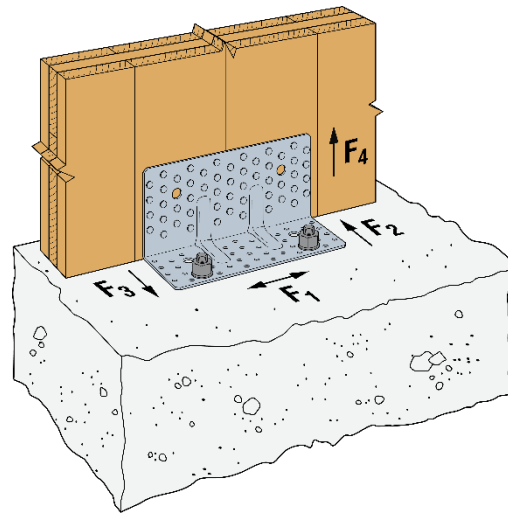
ABR255 – CLT to Concrete (Anchor Option 2)
